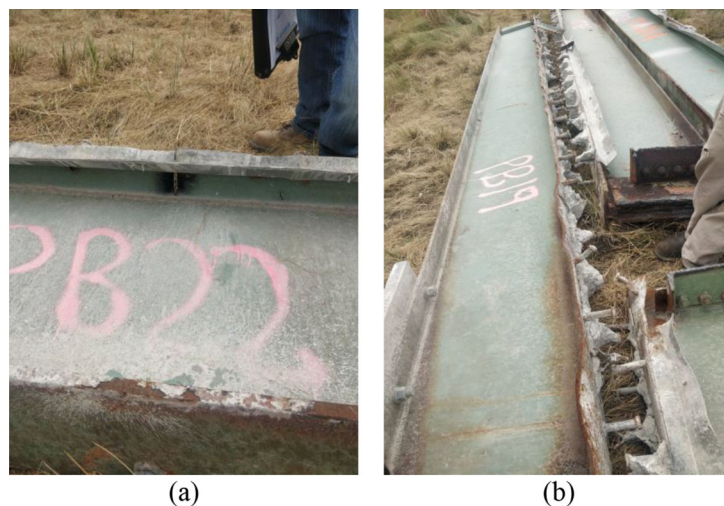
Damage to corroded girders during demolition: (a) damage to the top flange during concrete deck saw cutting, and (b) damage to the entire top flange due to excavator during concrete deck breaking (courtesy of HNTB).
